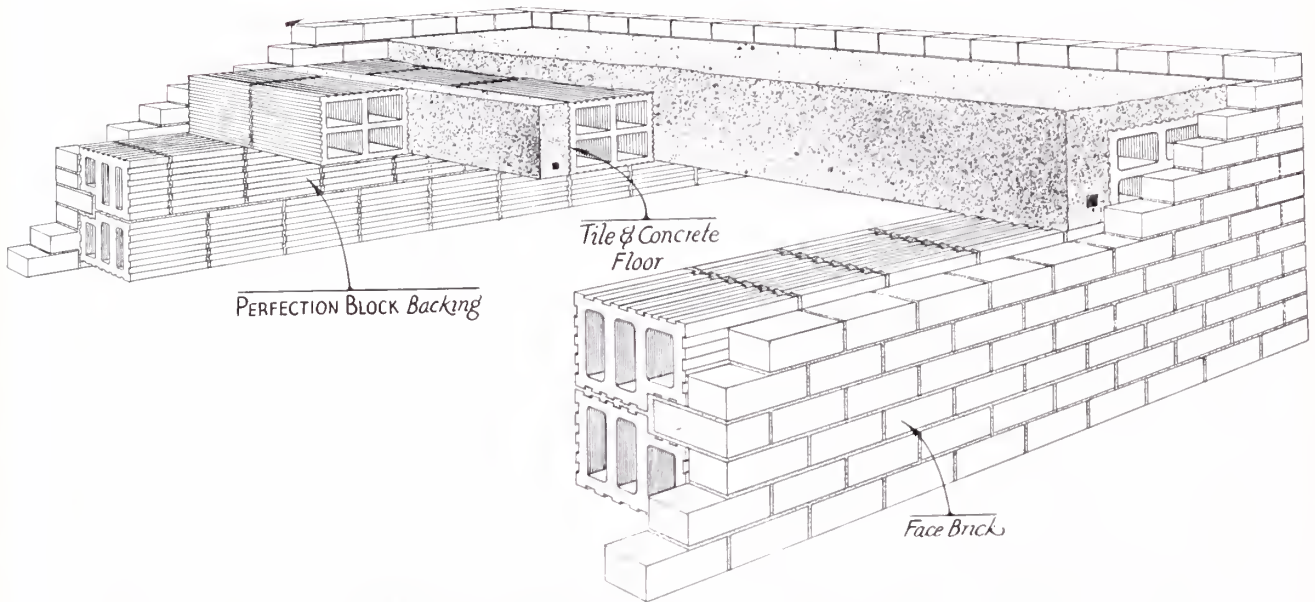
Illustrating PERFECTION BLOCK backup carrying combination reinforced concrete and hollow tile floor.
